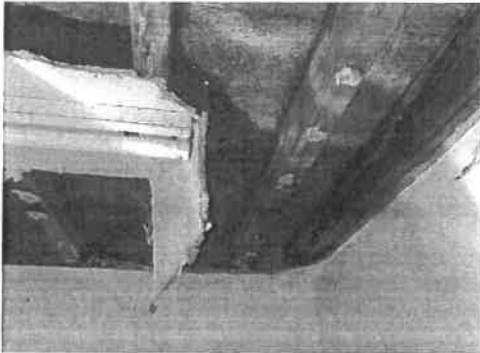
Damaged ceiling with wooden beams, plywood and breeze blocks exposed
